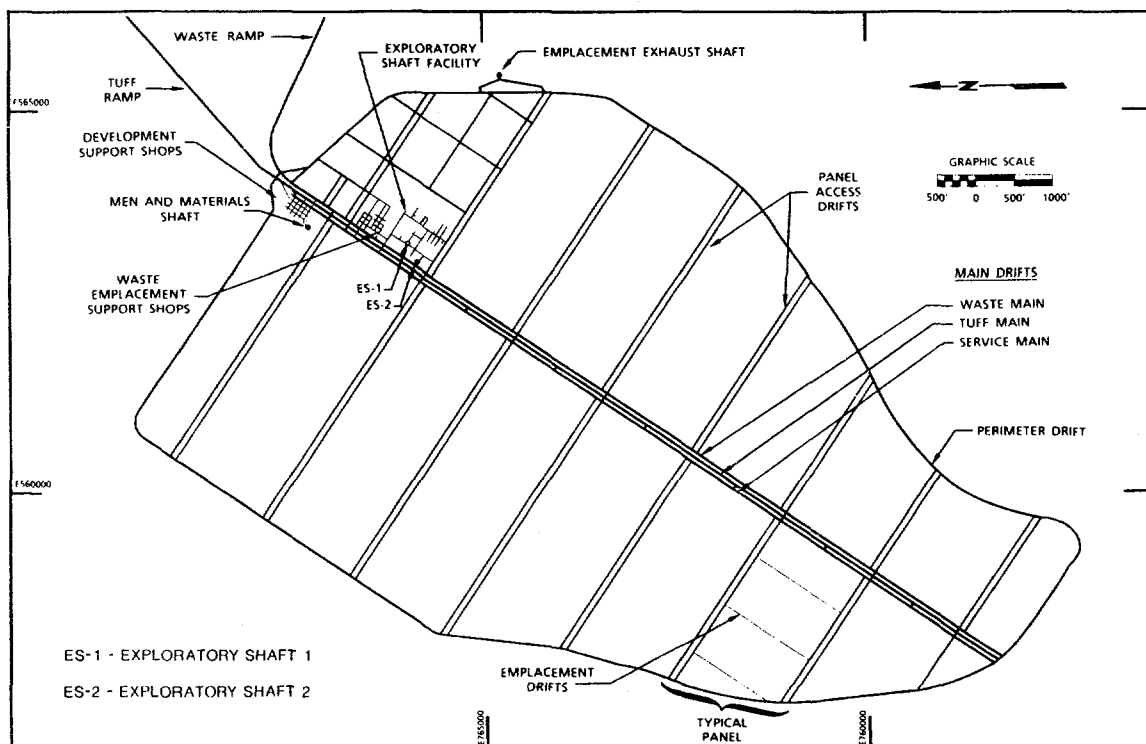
Underground repository layout for the horizontal waste-emplacement configuration.
